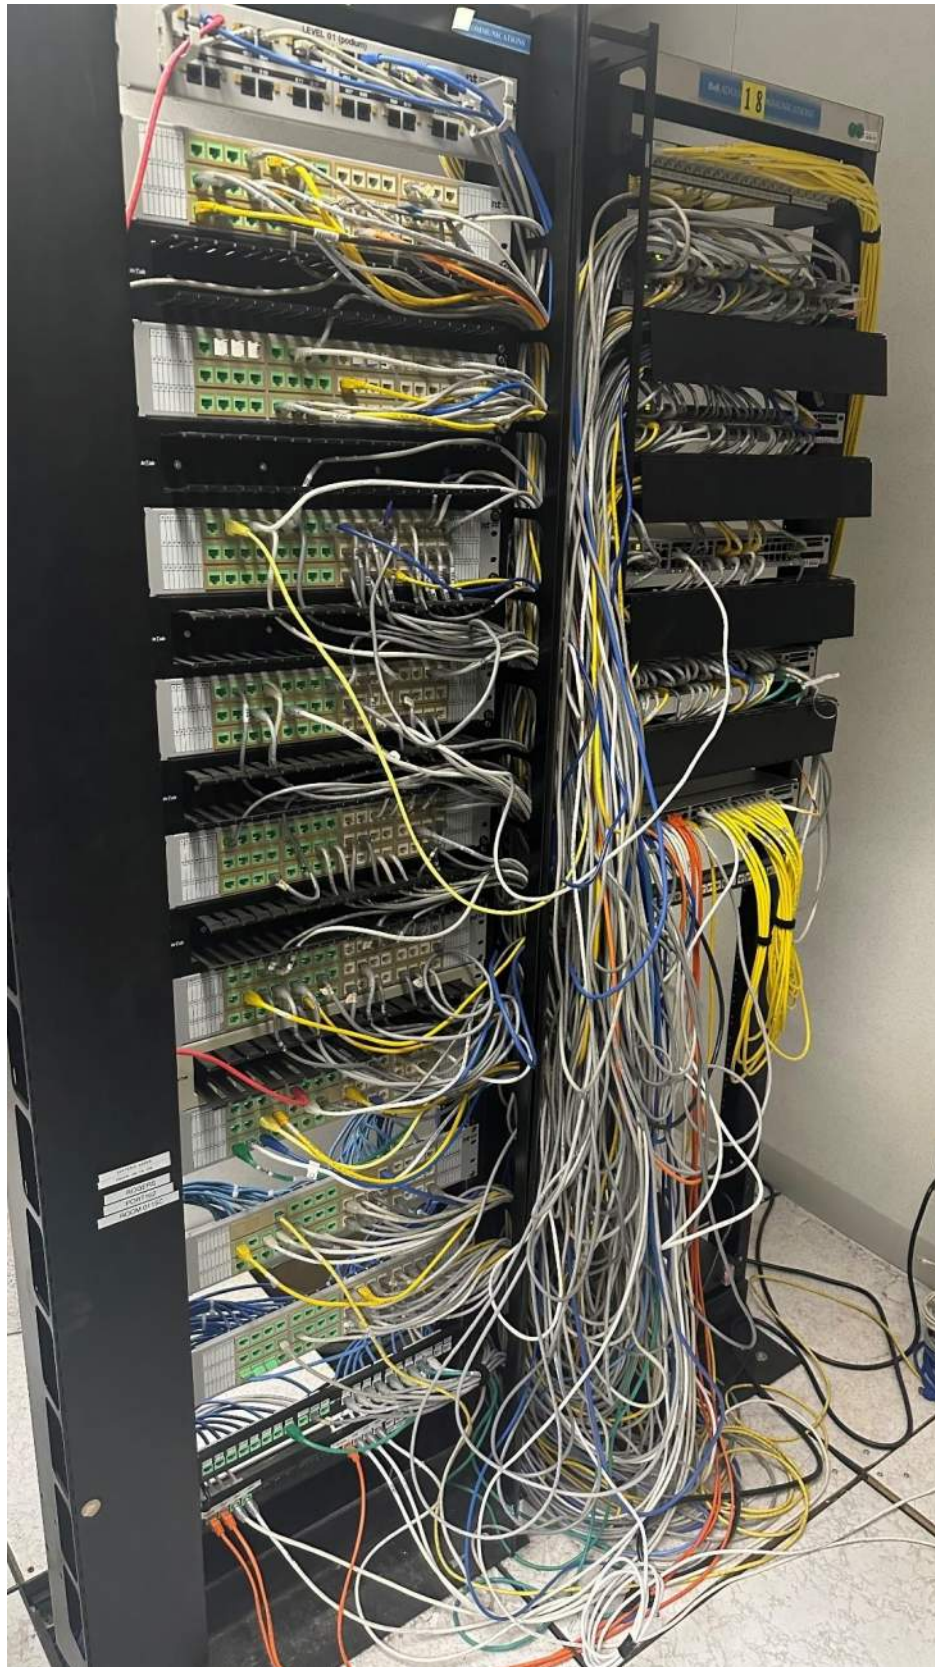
Brooke Claxton Building – IT Room Cabling Condition (3)
